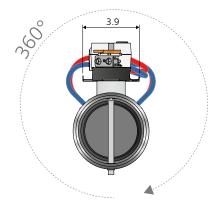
Dimensions (in), REACT V GMB circular. The damper can be installed at an optional angle.
